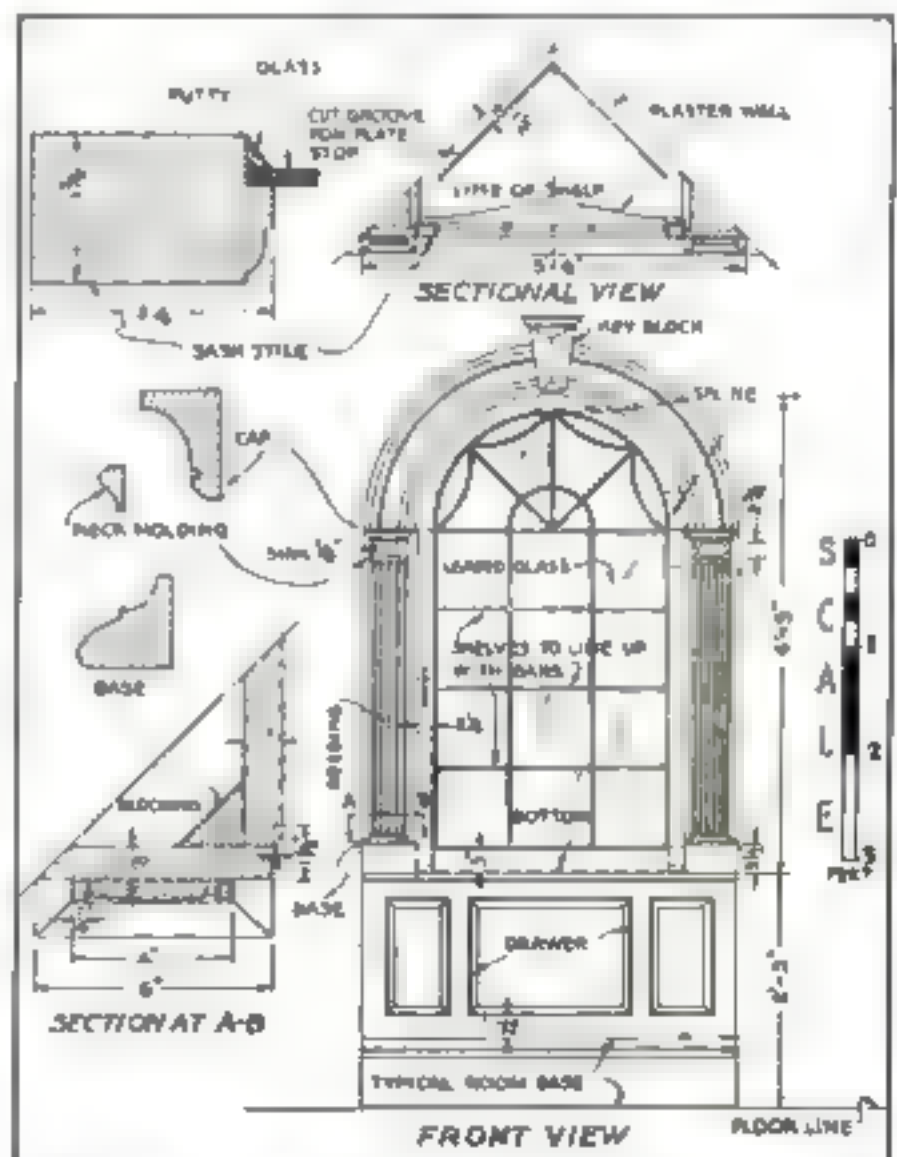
Assembled views of the built-in china closet, details of the shelf construction, sash stile, and moldings, and section of the corner frame.
